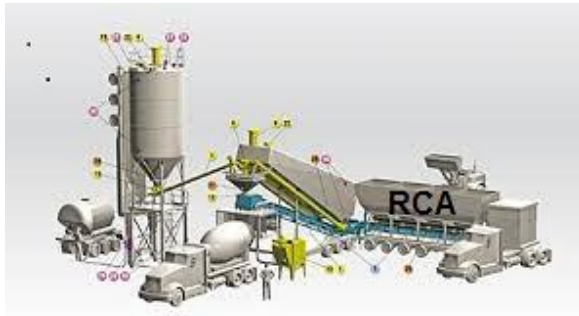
RCA in the Concrete Ready Mix Plant (adapted from warnngroup.com)
